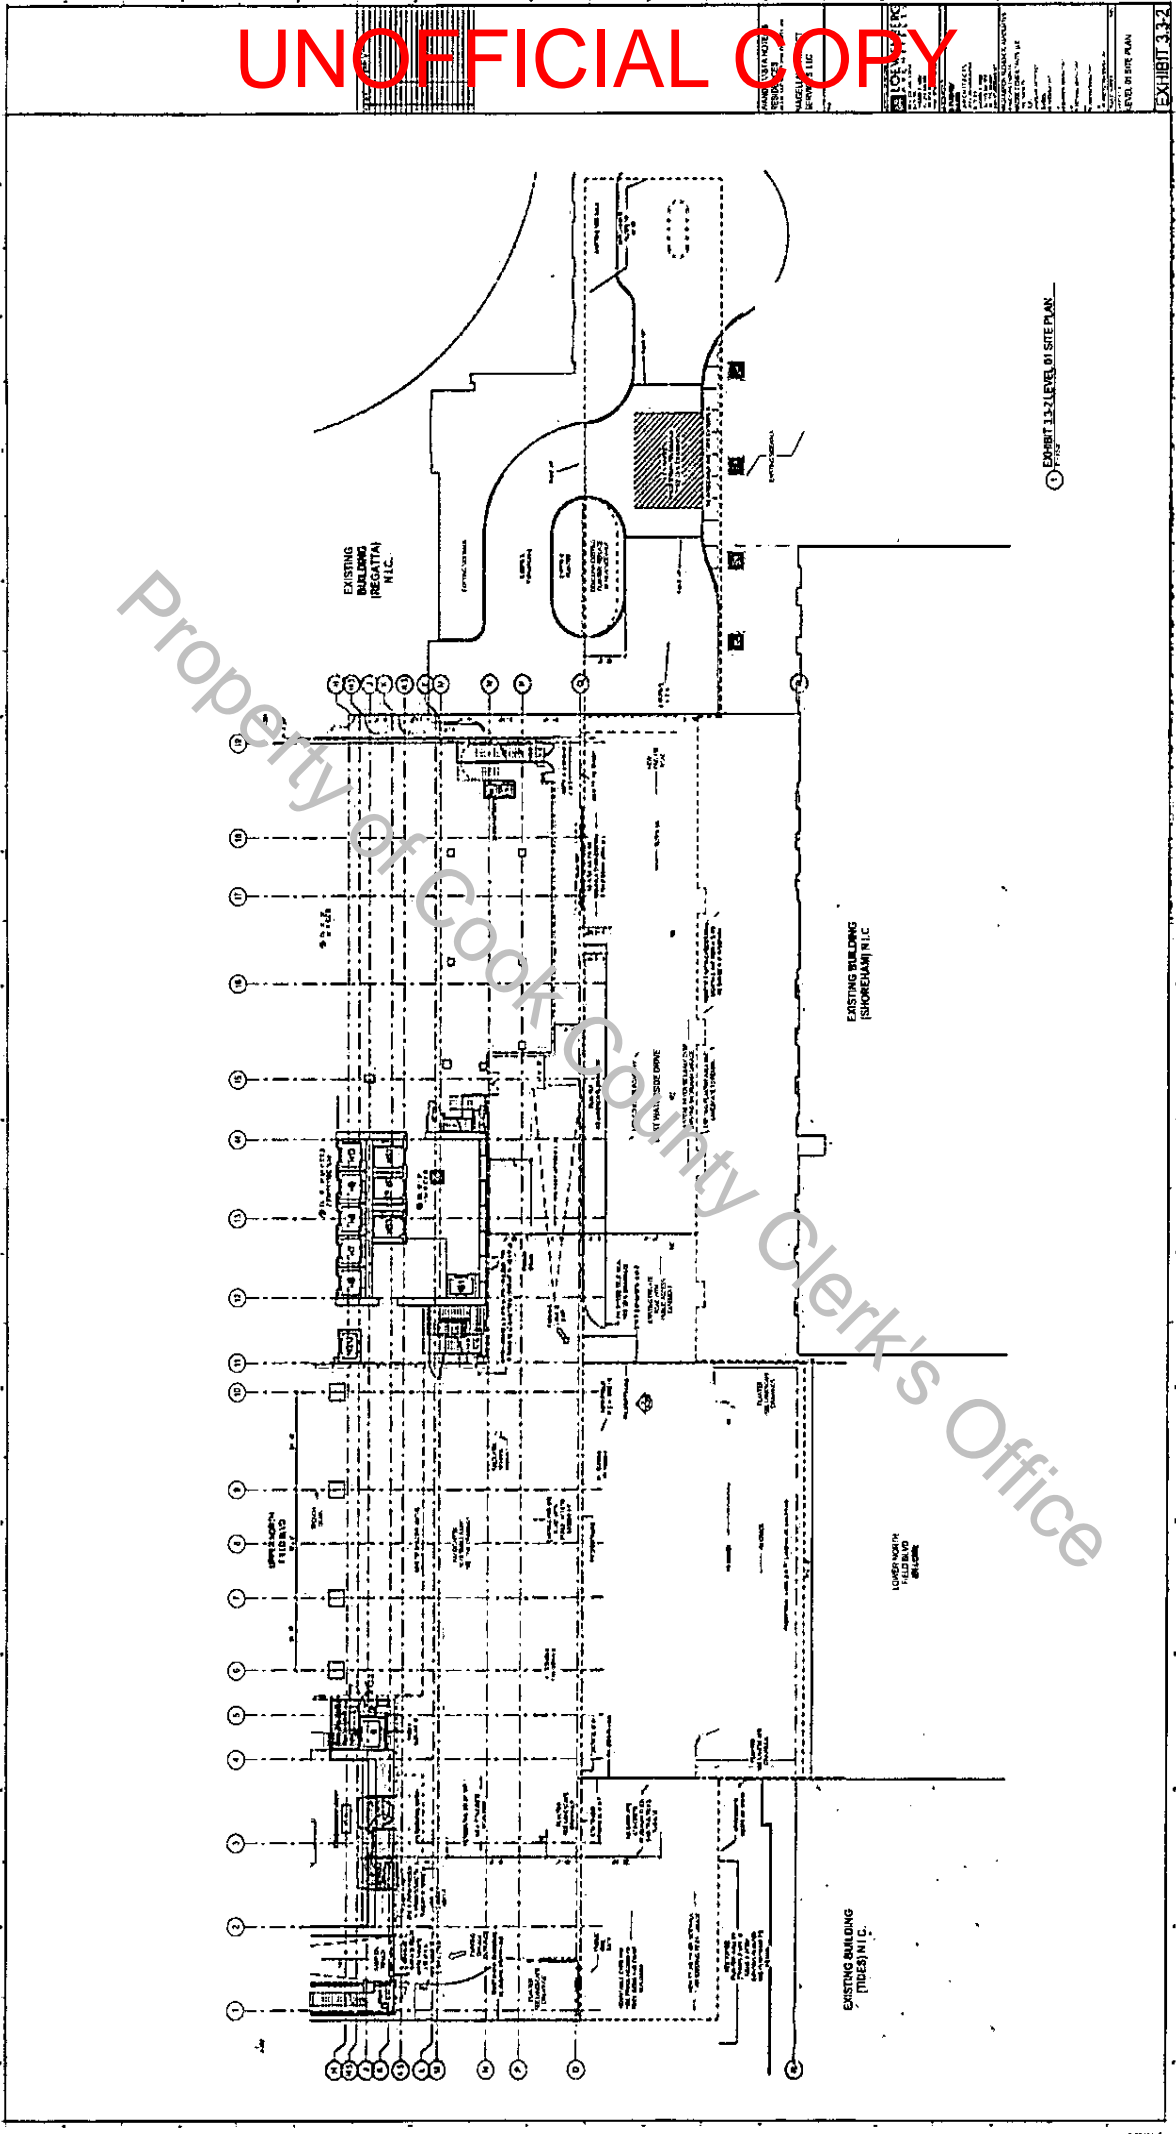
LEVEL 01 SITE PLAN
